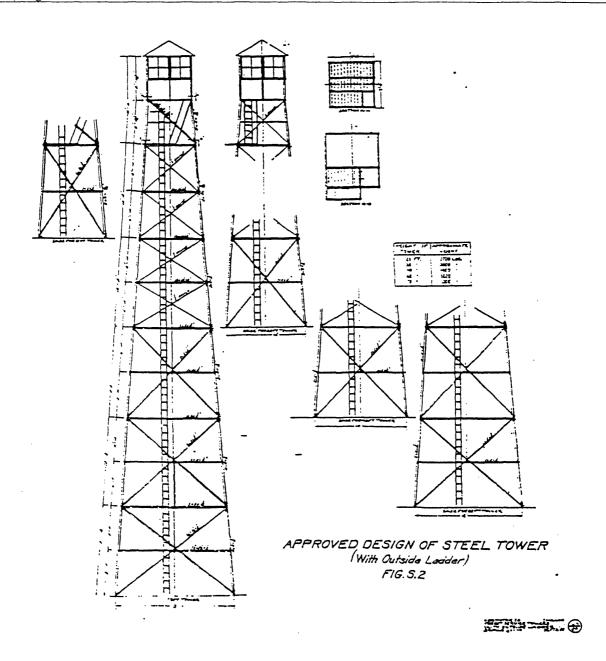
"Approved Design of Steel Tower (with Outside Ladder)." These "light duty" towers were the first group of new steel lookout towers used in New York. Braced with lighter gauge steel due to the use of an outside ladder in place of a staircase, they were easier to haul to the summits but proved unsuitable for use by the public. (W. B. Greeley, Specifications and Plans for Lookout Towers. Washington, DC: U.S.D.A. Forest Service, 1924)
